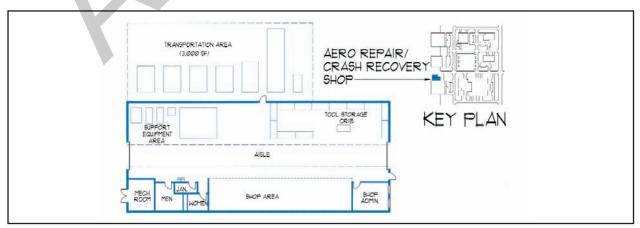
I: Concept Floor Plan for the Aero Repair/Crash Recovery Shop.
